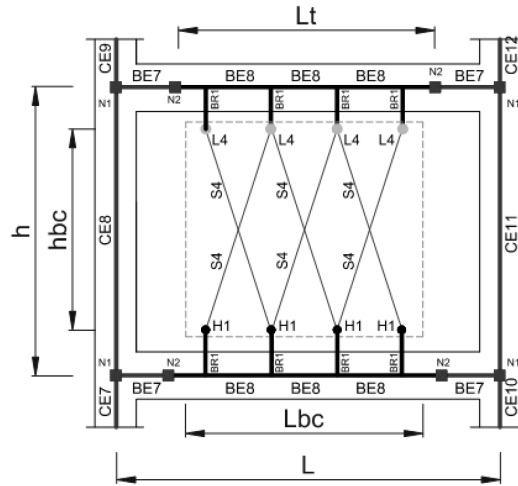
Geometrical configuration of the MSM03-BC Strip Model placed into a one floor-one bay framed structure
